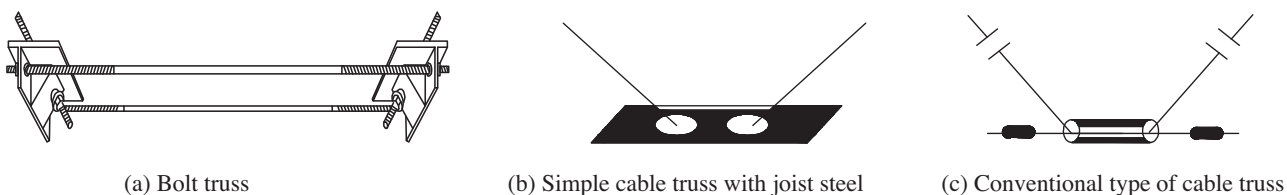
Schematic diagrams showing bolt or cable truss systems.
